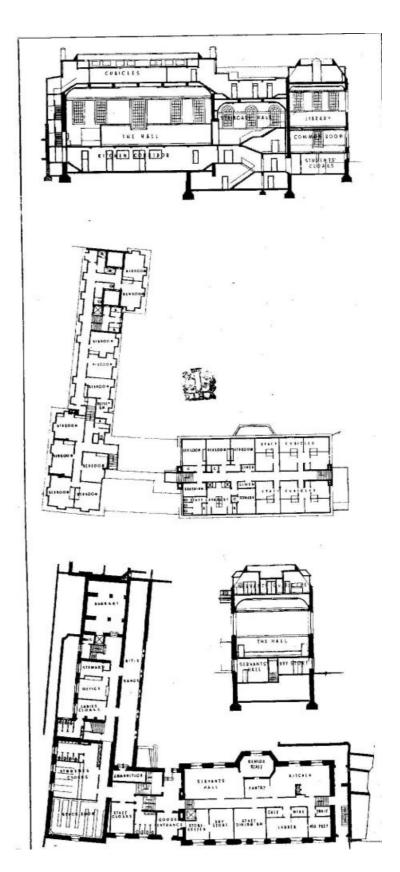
From the top: Long section through hall, looking towards the street; third floor plan; lower ground floor, and cross section through hall [© The Architect & Building News
